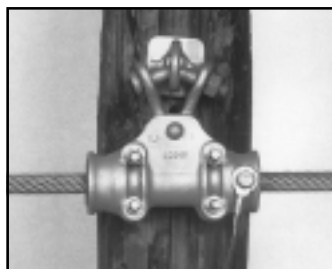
B - INSTALL GROUNDING WIRE ASSEMBLY
